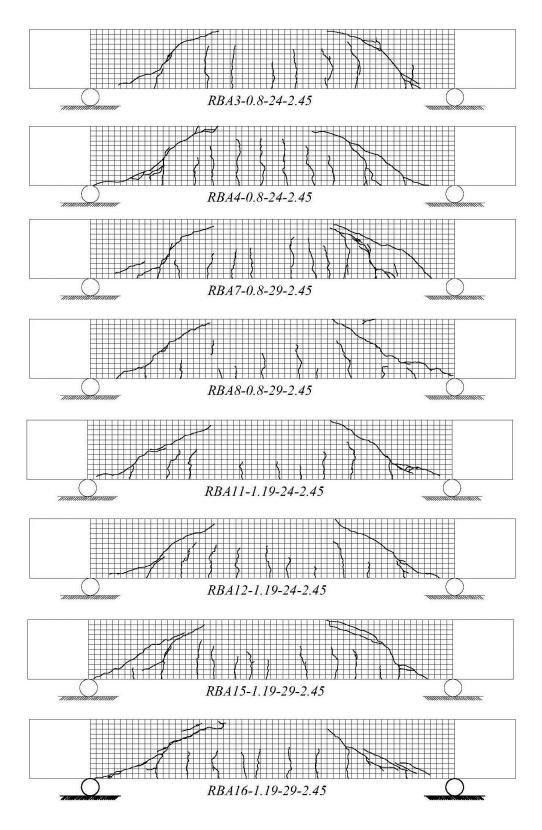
Failure Patterns of Recycled Brick Aggregate Beams
